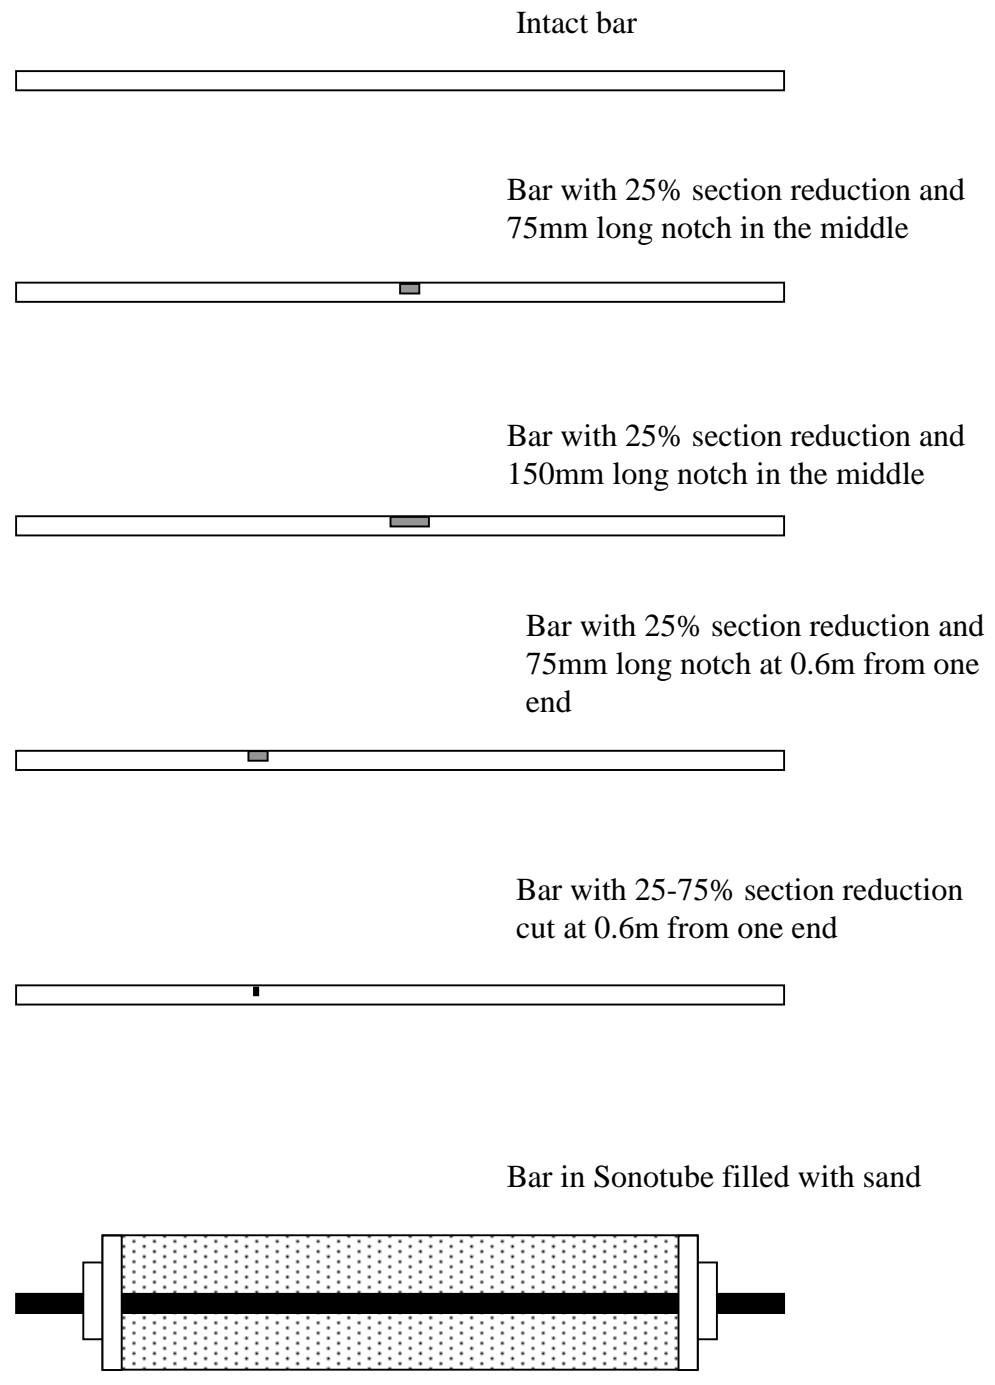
Bench-Scale Specimens- 2.0 m Long Plain Dywidag Bars.
